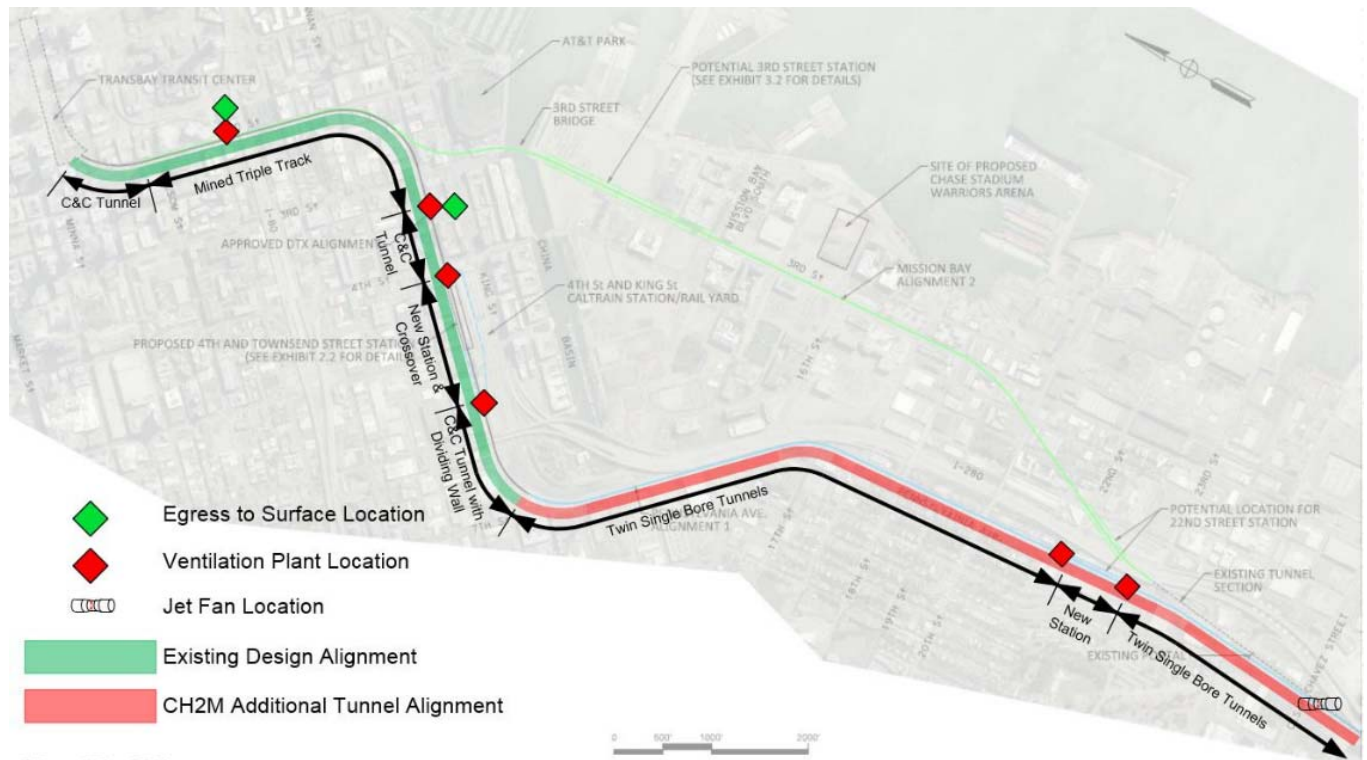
Pennsylvania Avenue Alignment, Ventilation Plan
